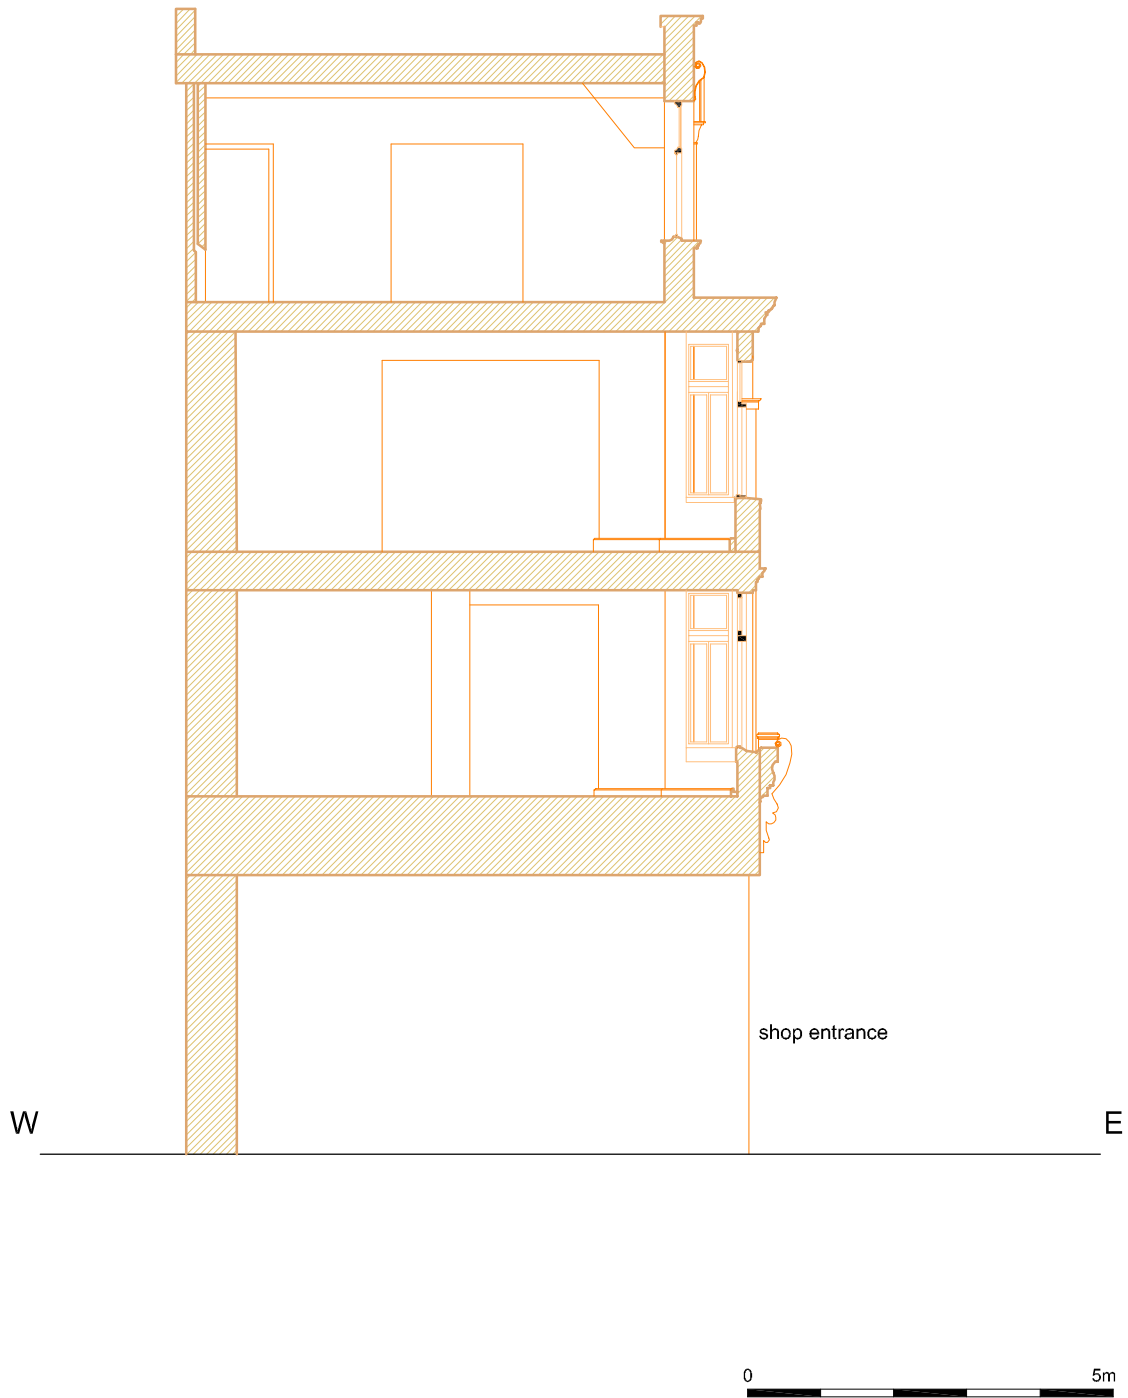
Sectional elevation west to east through the south end of Building 2, as recorded by MOL Archaeology
